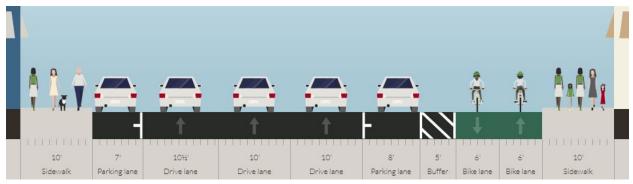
Typical Cross Section of Folsom Street between 11th and 10th streets, looking east
